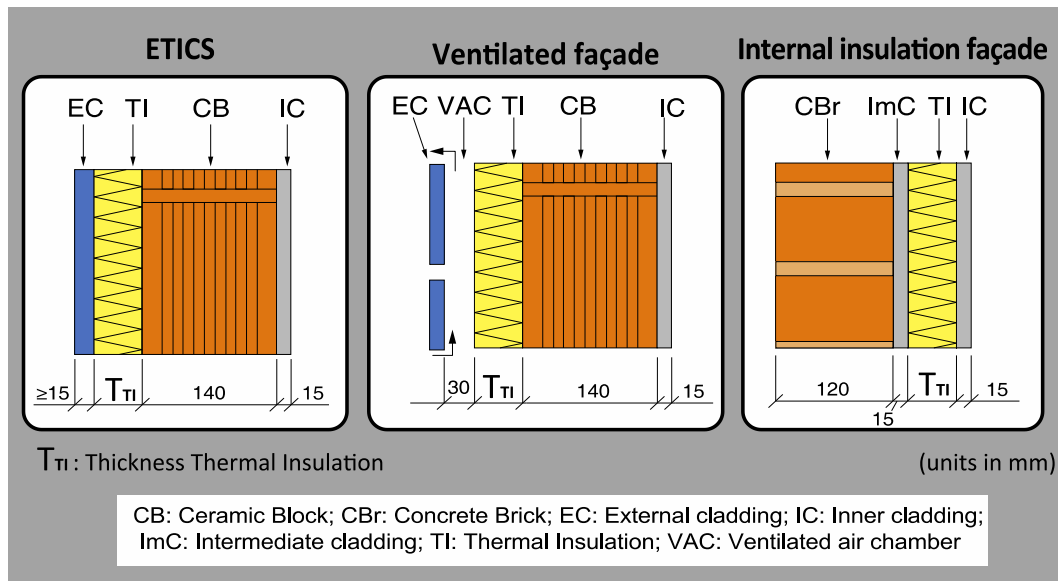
Constructive details of the studied façade systems (CSIC, 2008).
